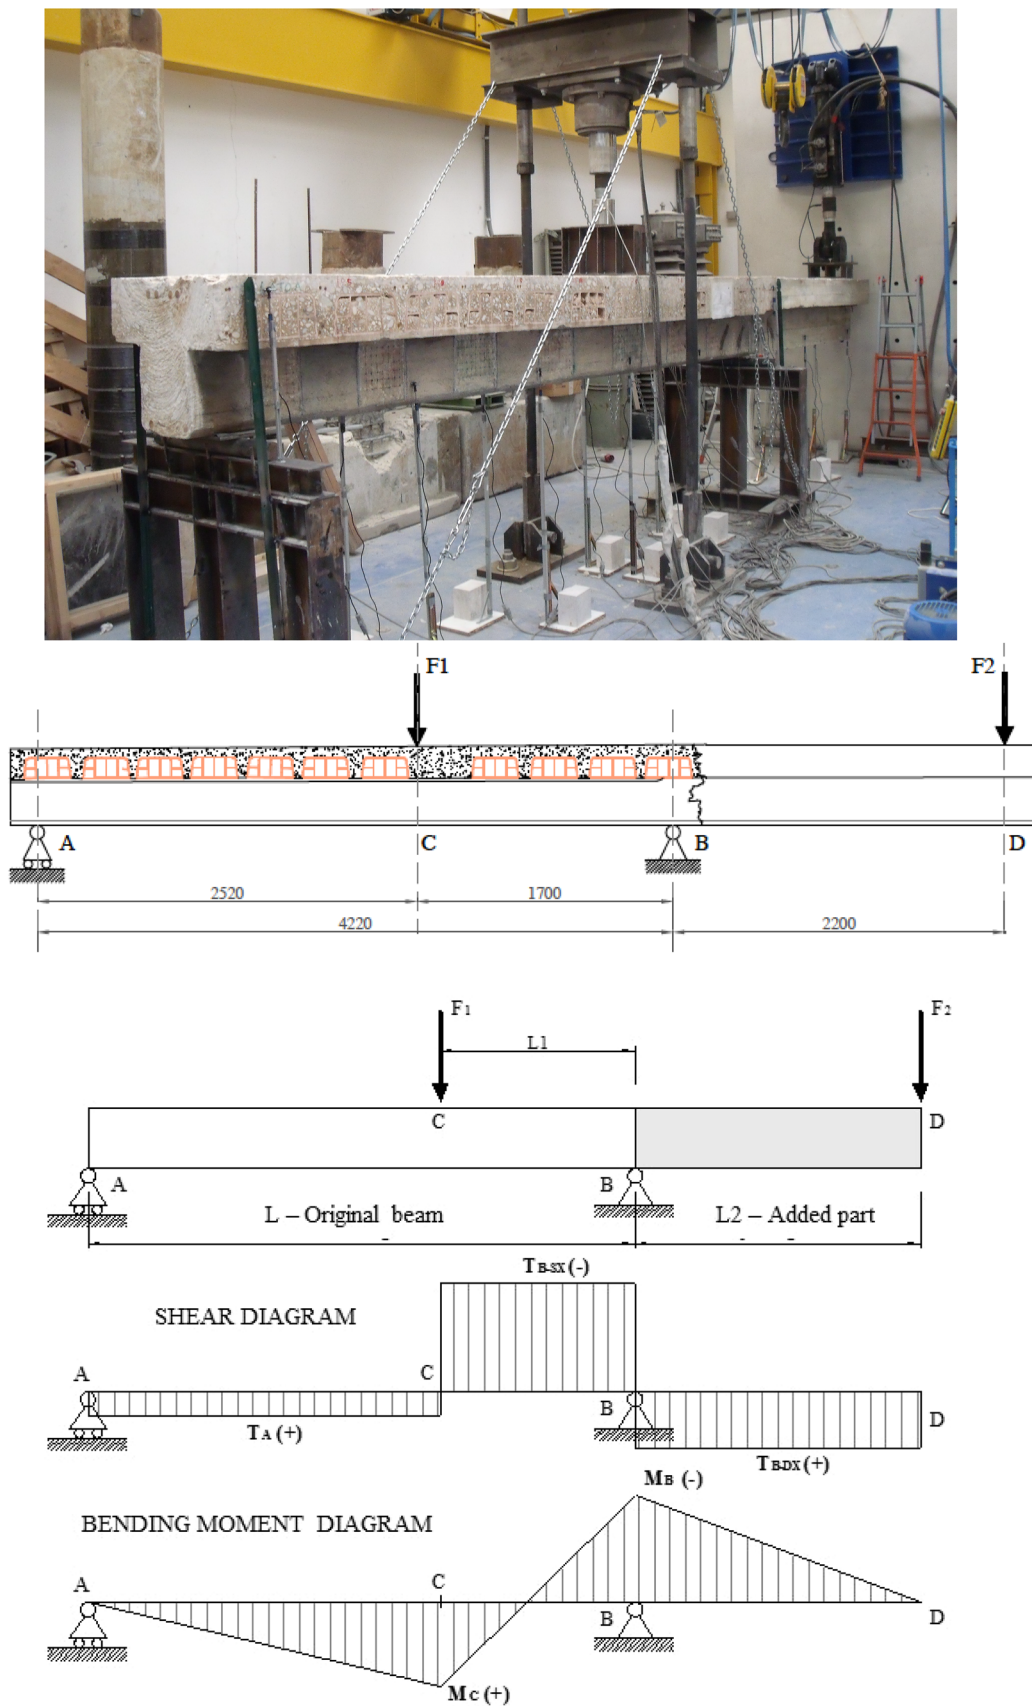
Beam specimen with added cantilever (top), test load scheme (center) and internal forces (bottom); (mm)
